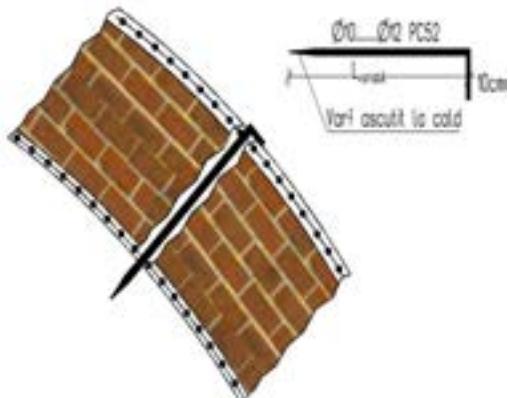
Jacketing of masonry vaults polymer mesh - (photo João Appleton)
